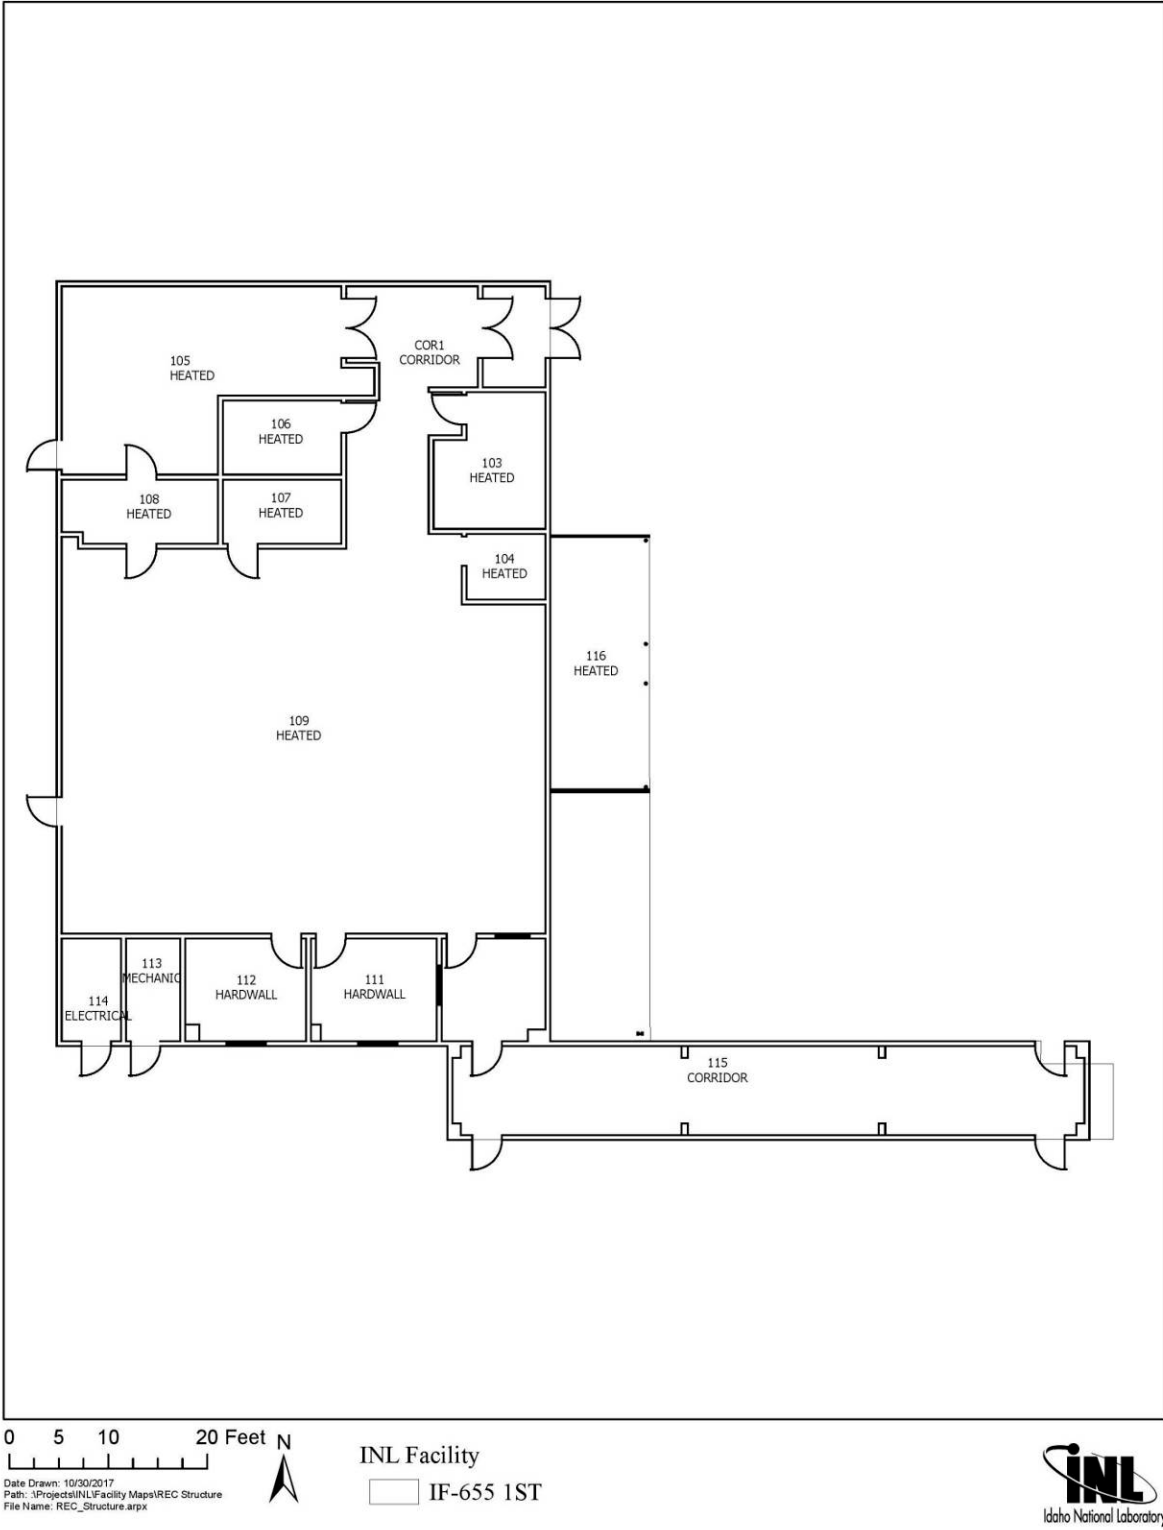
IRC Chemical Storage Facility (IF-655) floor plan.
